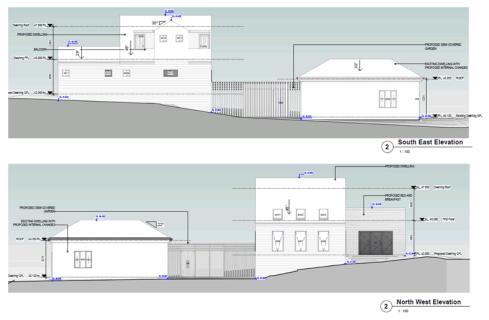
Southeast and Northwest Elevations showing existing dwelling and proposed extension (Beehive Design, 2021)
